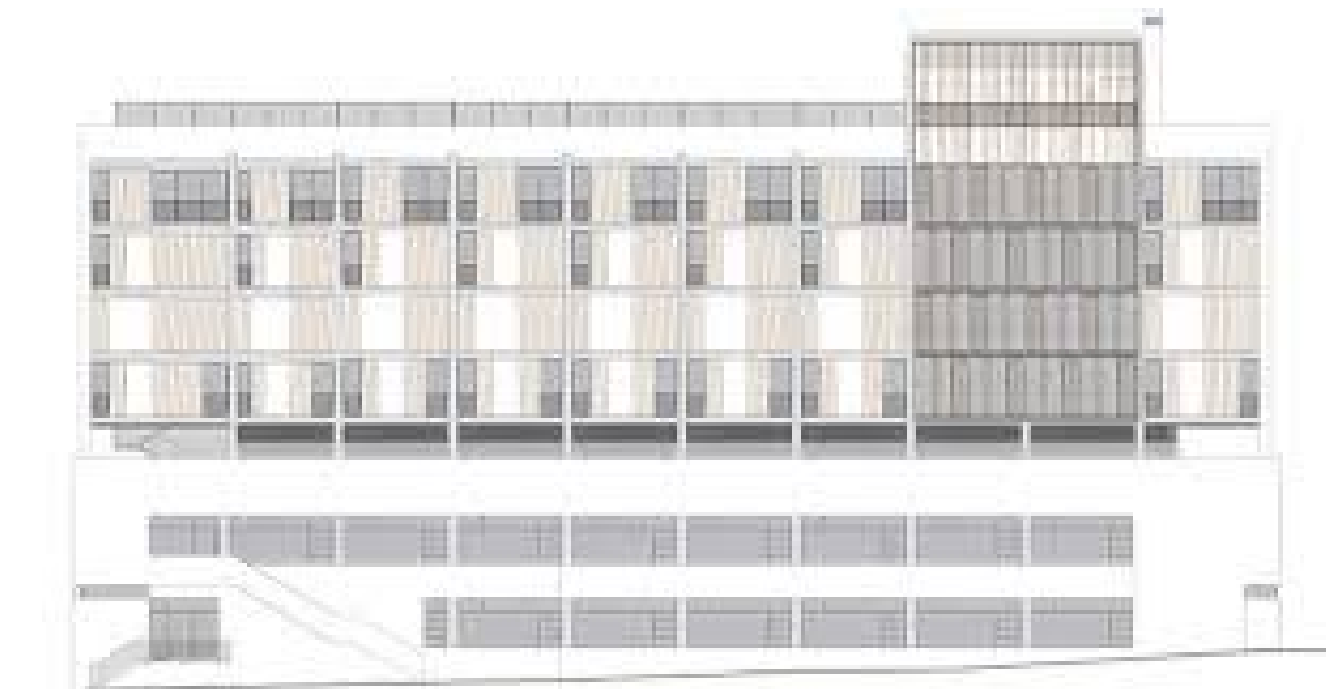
Plaza de America west elevation showing the rectangular forms that are highlighted in the building shape. Photo by Premiosdearquitectura (www.premiosdearquitectura.es/en/awards/30-avs-awards-2010/all-proposals/528-72-intergenerational-housing-health-centre-and-day-center-at-plaza-of-america-alicante)
